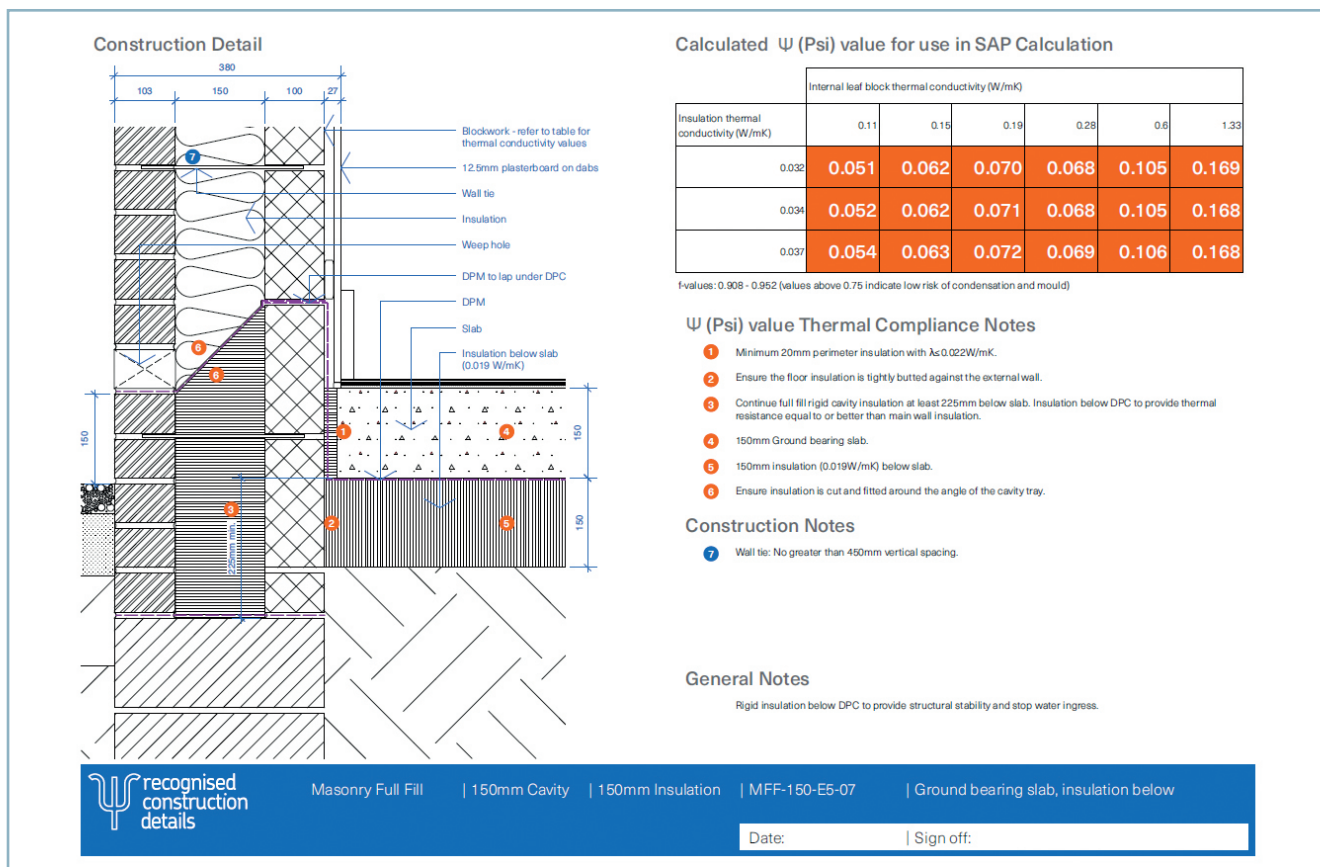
Example of a Recognised Construction Detail (E5-07, ground floor, insulation below slab)
